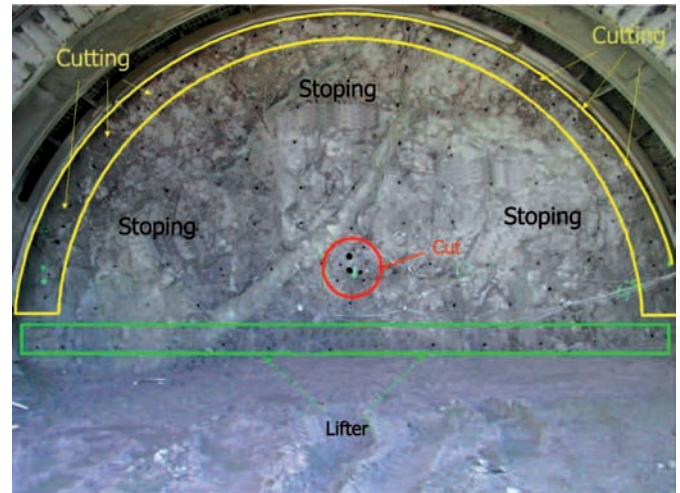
marking out of the various zones of the firing plan for the Lioran tunnel (source: LRPC - Clermont-Ferrand)
